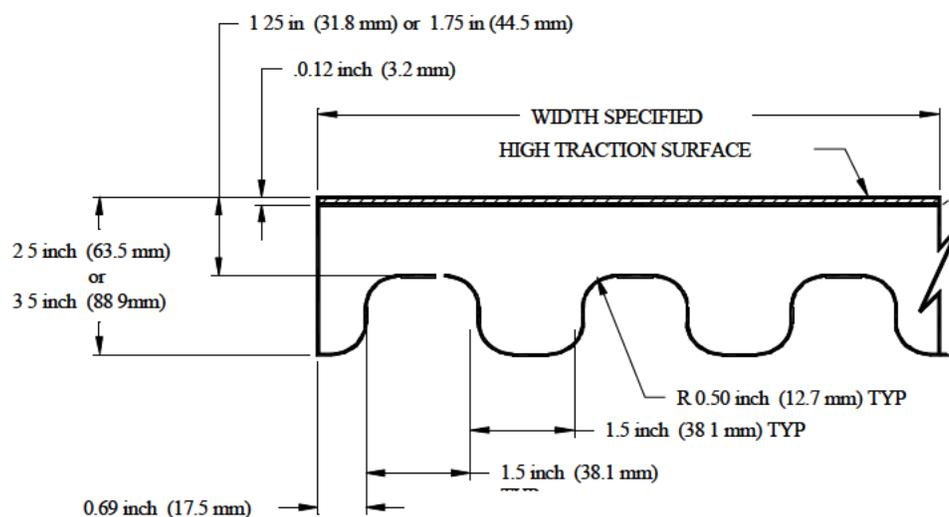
Typical Synthetic Decking Cross Section (Dimensions Are Nominal)
